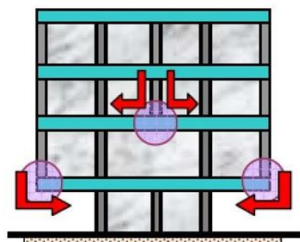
Floating column [Source: A. P. Munda et. al.]
